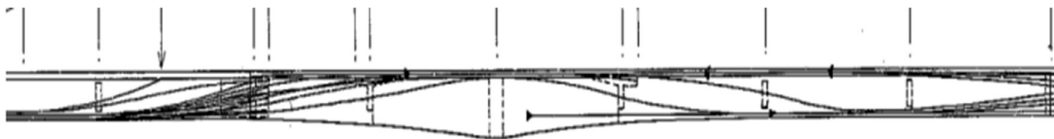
Prestressing reinforcement for one symmetrical half of the bridge
